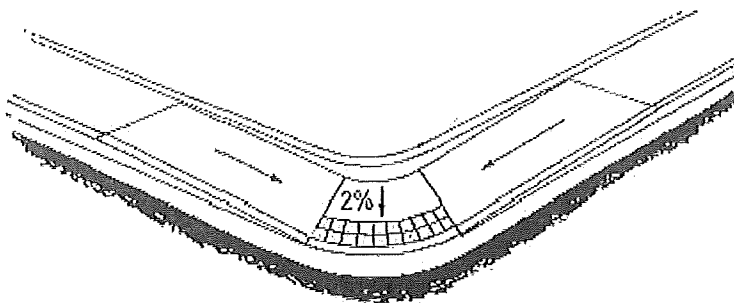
On narrow sidewalks with tight turning radii, a single parallel curb ramp may be considered.
